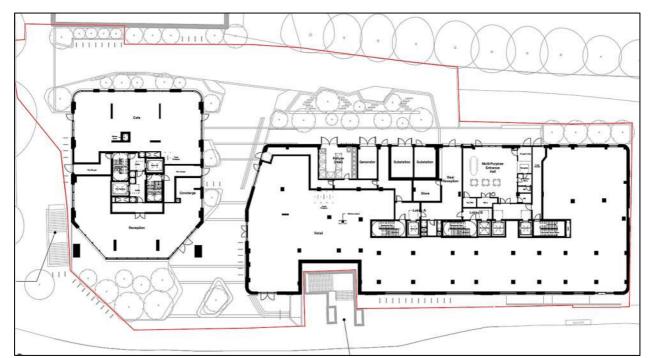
Extract of Architect's Ground Floor Plan showing Landscaping
